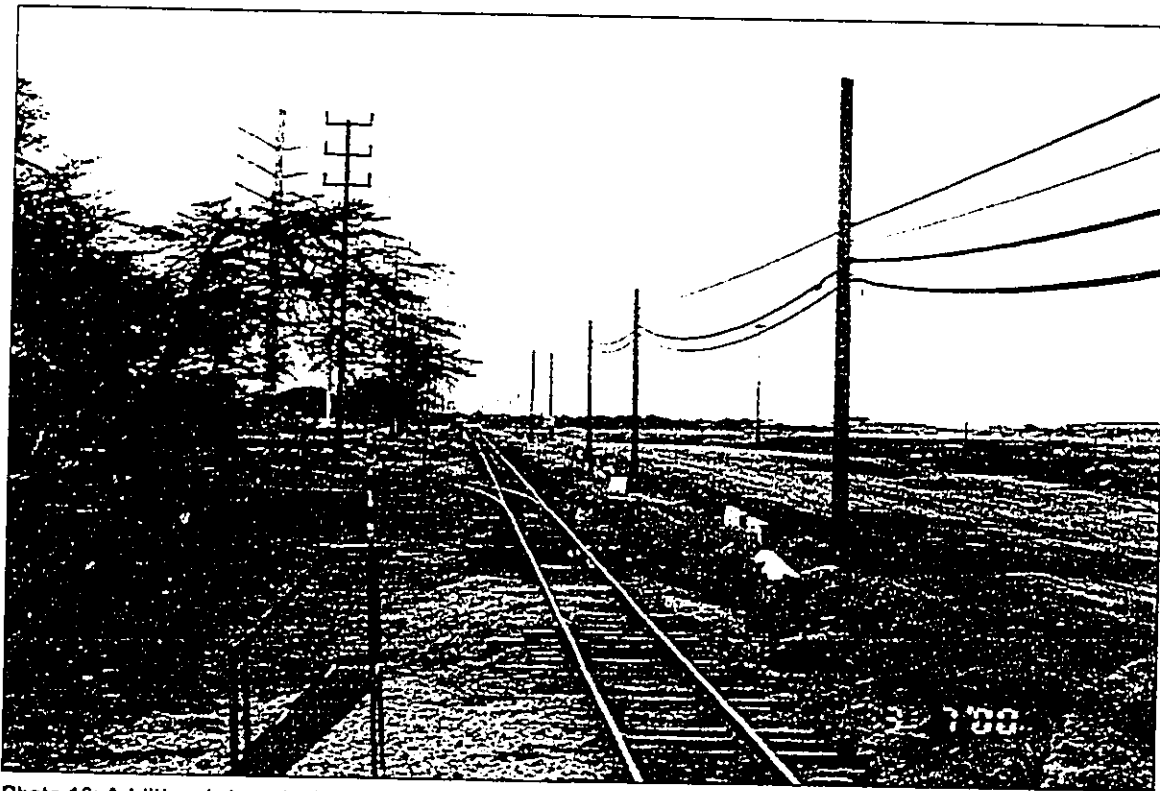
Additional views looking west along the proposed project area at the Hawaiian Railway Society.
